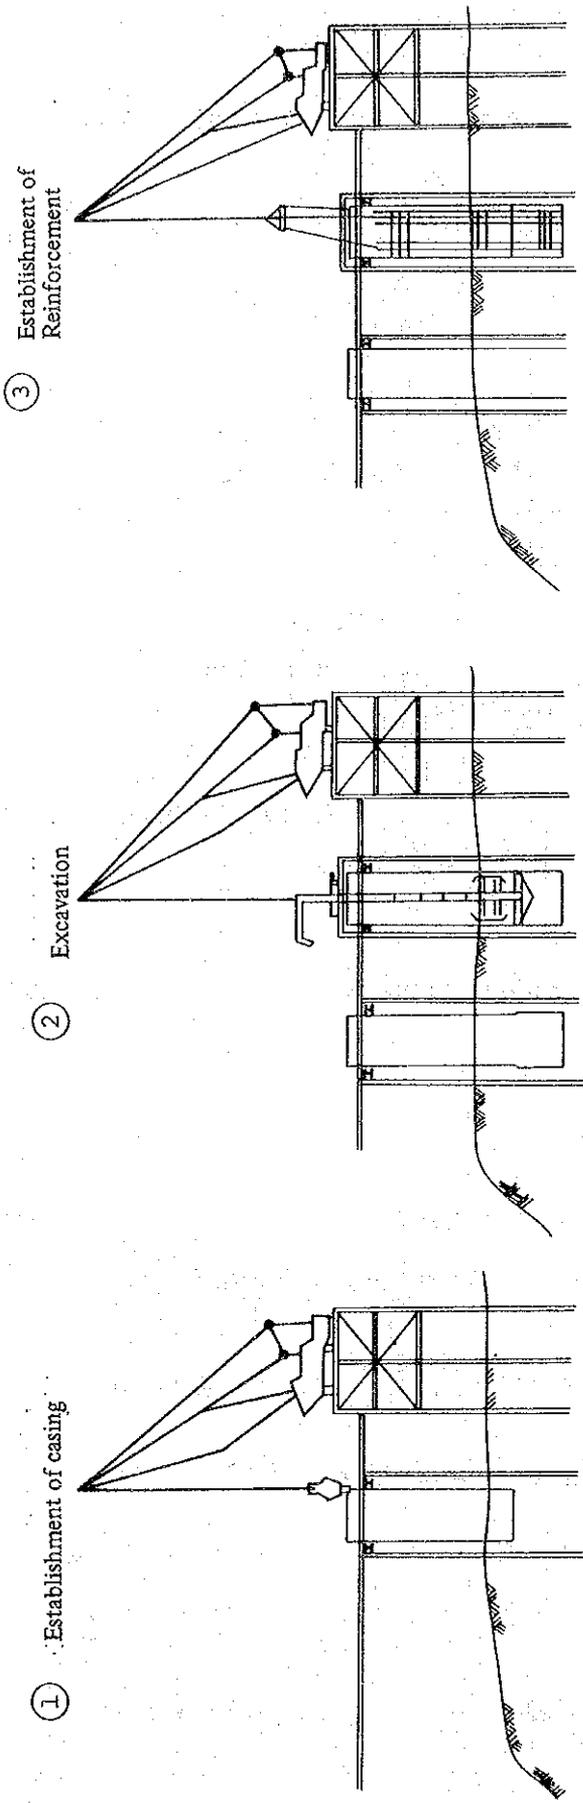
CONCEPTIONAL PLAN OF PILE CONSTRUCTION
